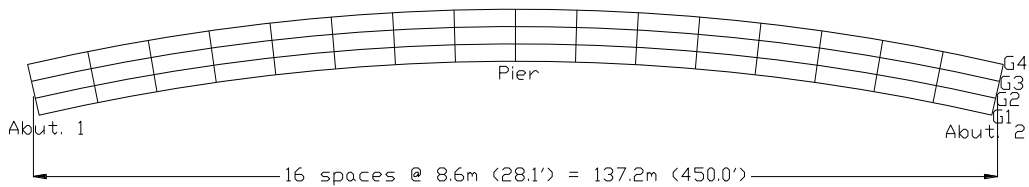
Simplified Framing Plan, Balanced Two-Span, 4-Girder, 305-m (1000-ft) Radius Bridge.
